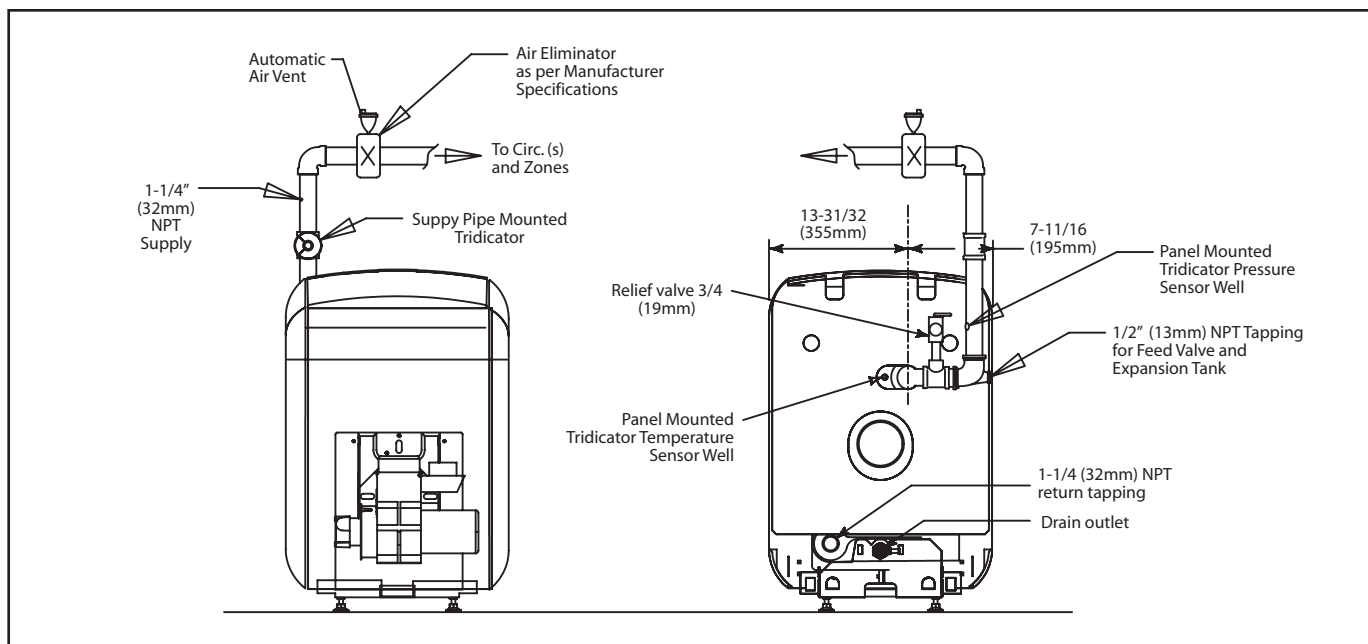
Air Eliminating System or Alternating Collecting System. Pipe off to a safe place the relief valve and drain outlet.
